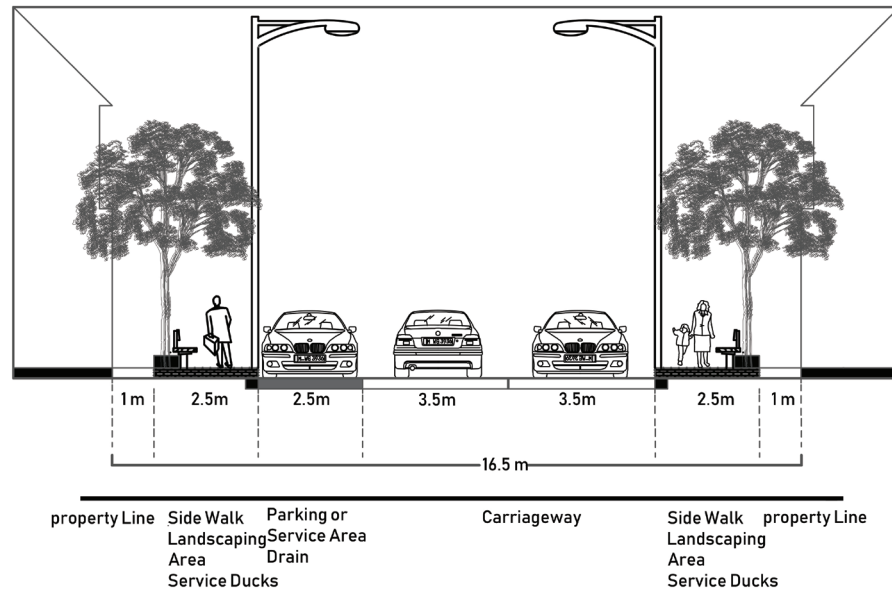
Cross section of a Level 02 – Functional Road - (Road Type – 2-B)
